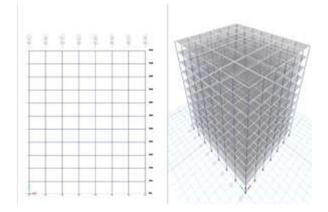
Elevation and 3D view of Regular G+10 Building on fixed base in different type of soil
